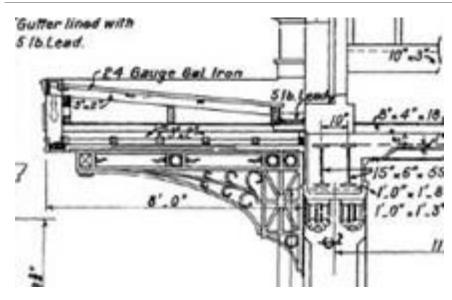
Extract from the original architectural drawing of the entrance to St James Station on St James Road indicating roofing to the awning was galvanised iron with a 5lb lead gutter.
